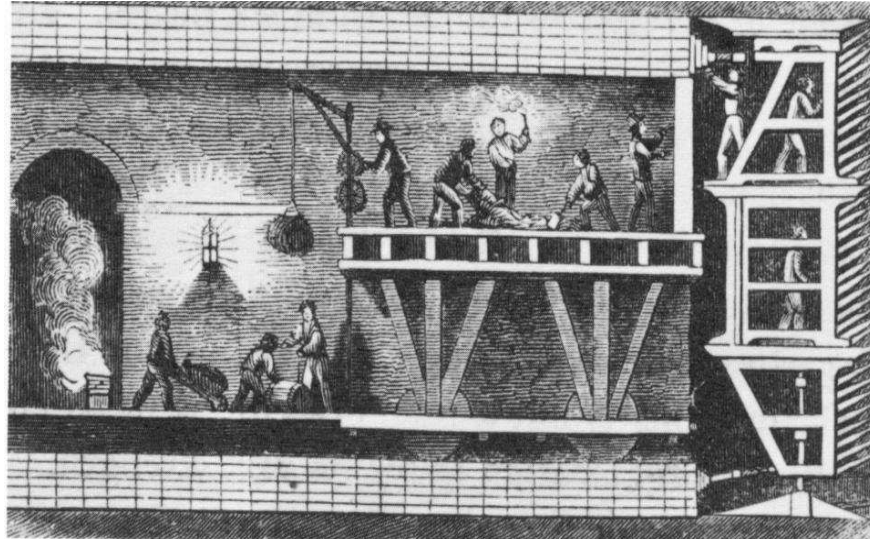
Diagram of the tunnelling shield used to construct the Thames Tunnel (Wikipedia, 2013)
